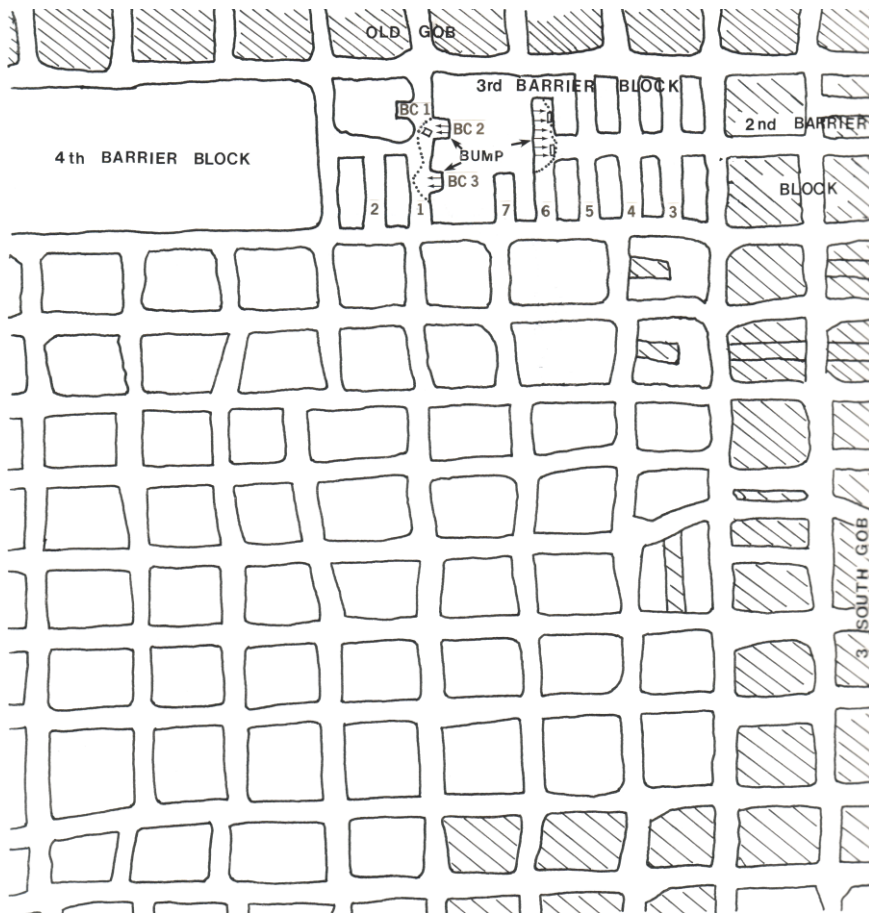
An example of bump occurred during barrier splitting (Peng, 1986)
